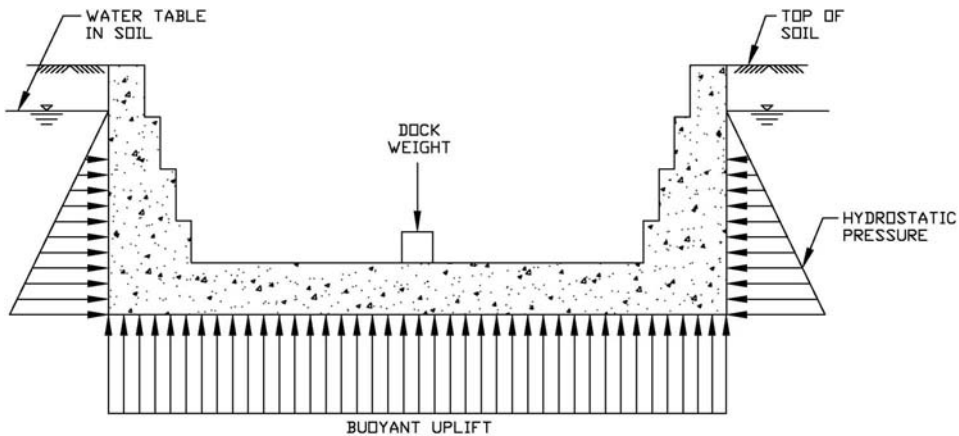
Mass gravity dry dock with hydrostatic forces shown
